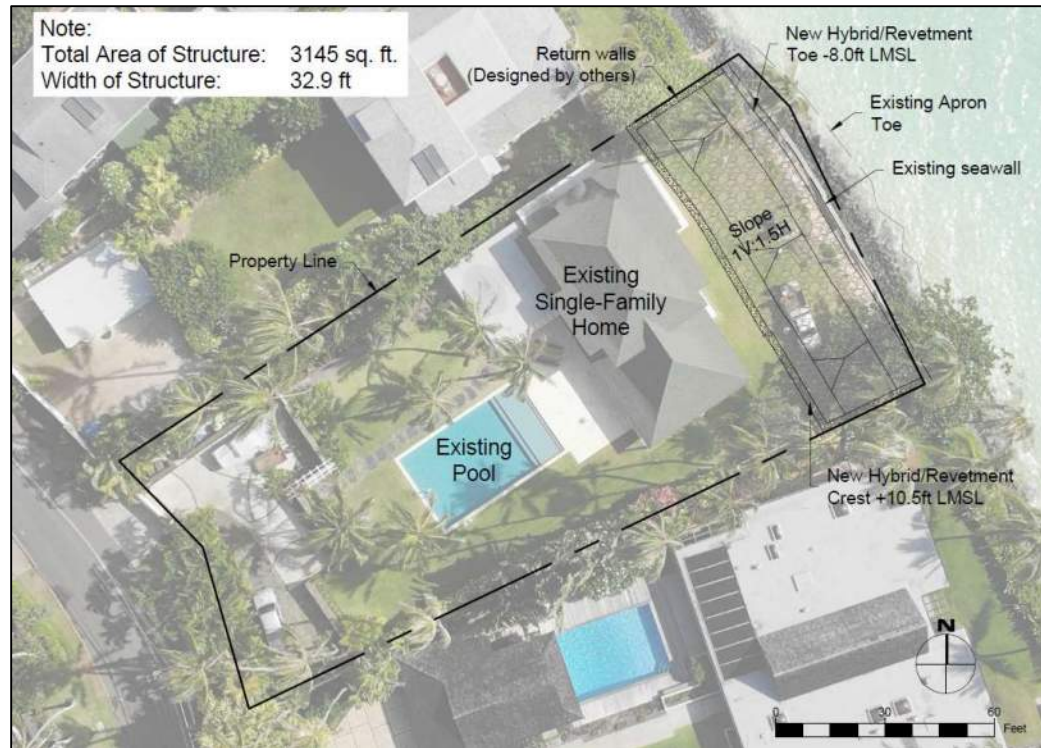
Conceptual plan view for hybrid seawall-revetment landward of the shoreline
